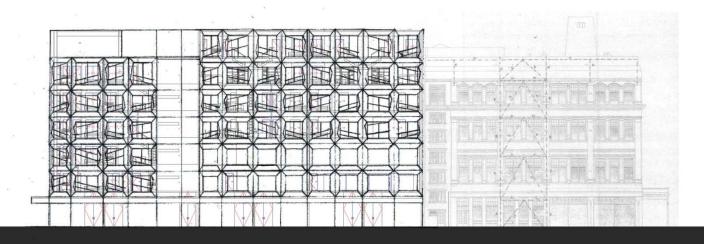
Irregular grid of rectangular modules sketched onto the exterior of the southern elevation. Watkins Building to the right.
